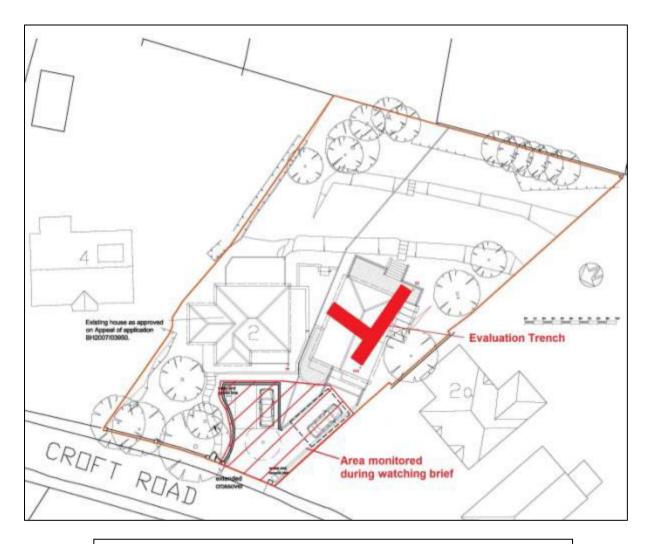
2 Croft Road, Brighton: Site plan showing the area monitored and the location of the earlier evaluation trench (Based on architects drawing)
